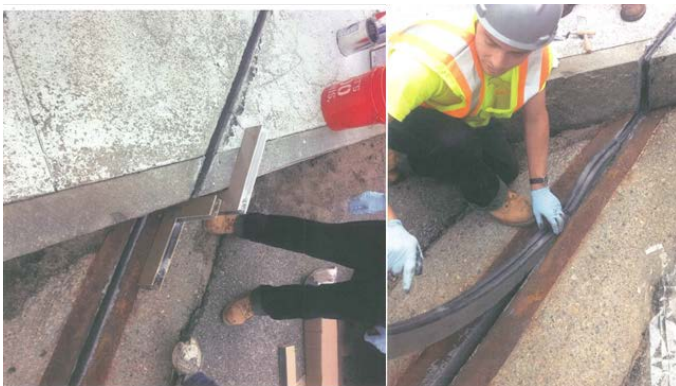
Installation of EM-SEAL on MassDOT Bridge
